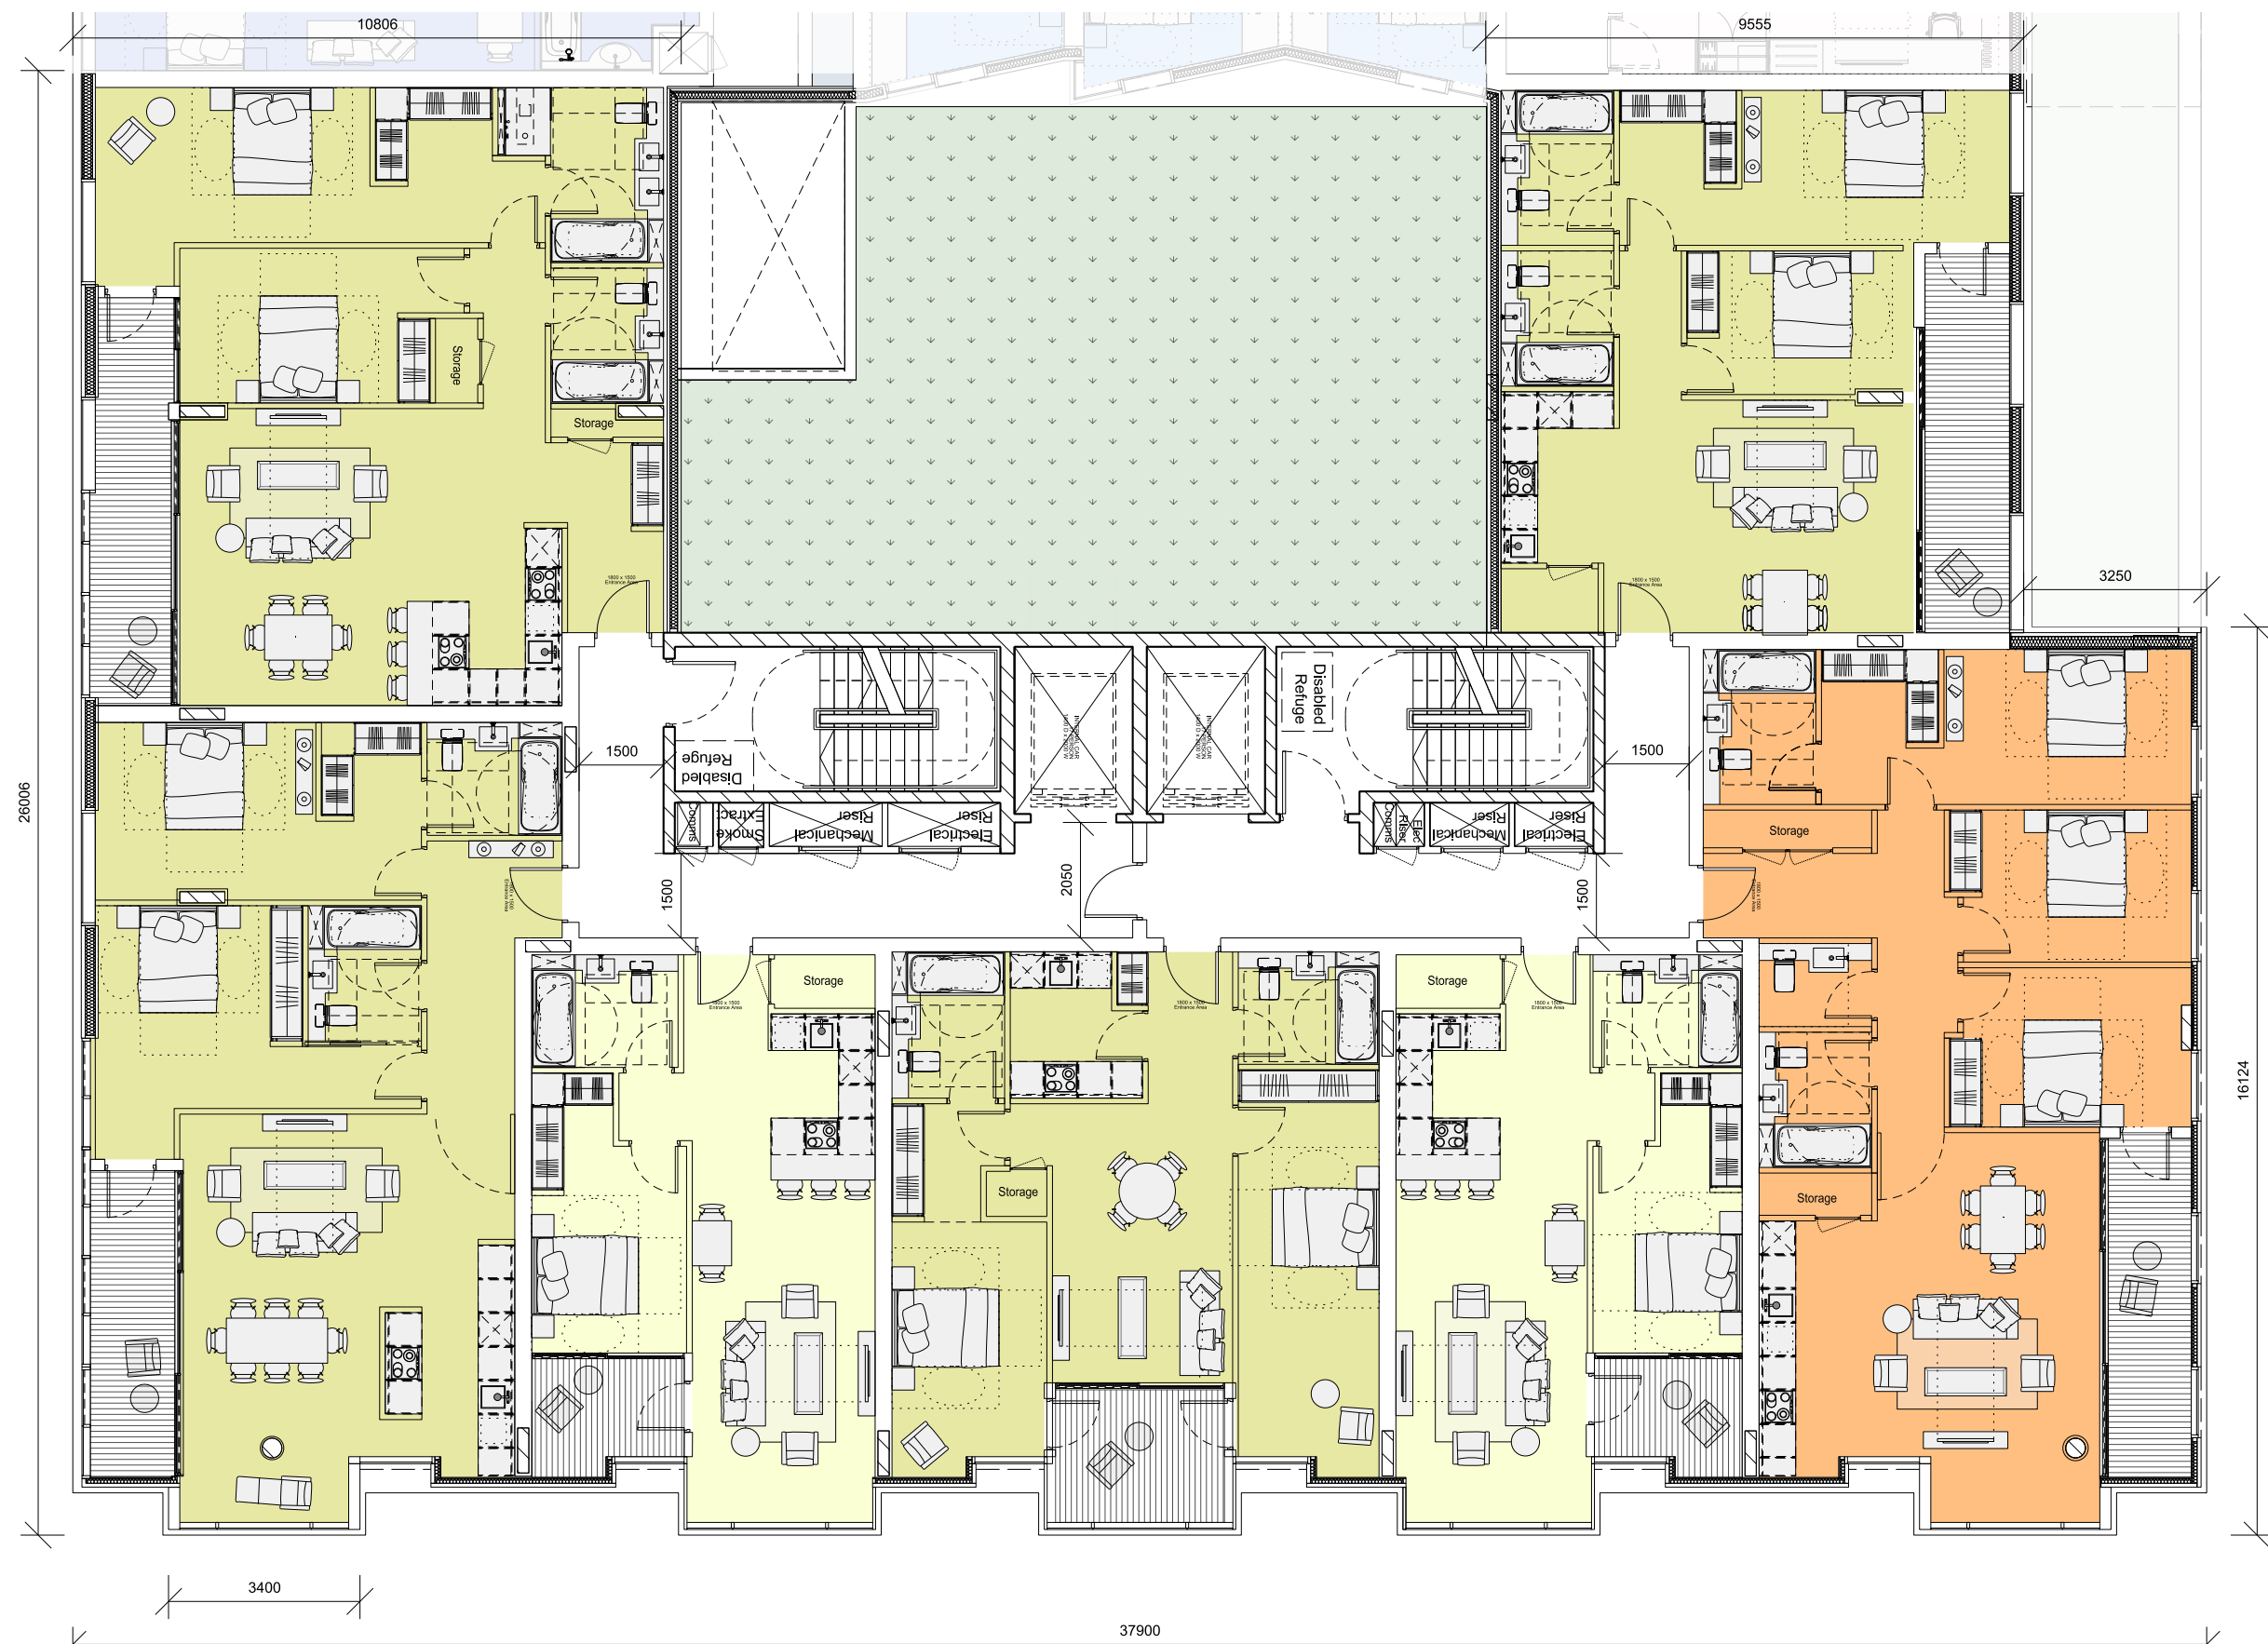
Levels 2 & 3 floor plan of the residential component of the building
